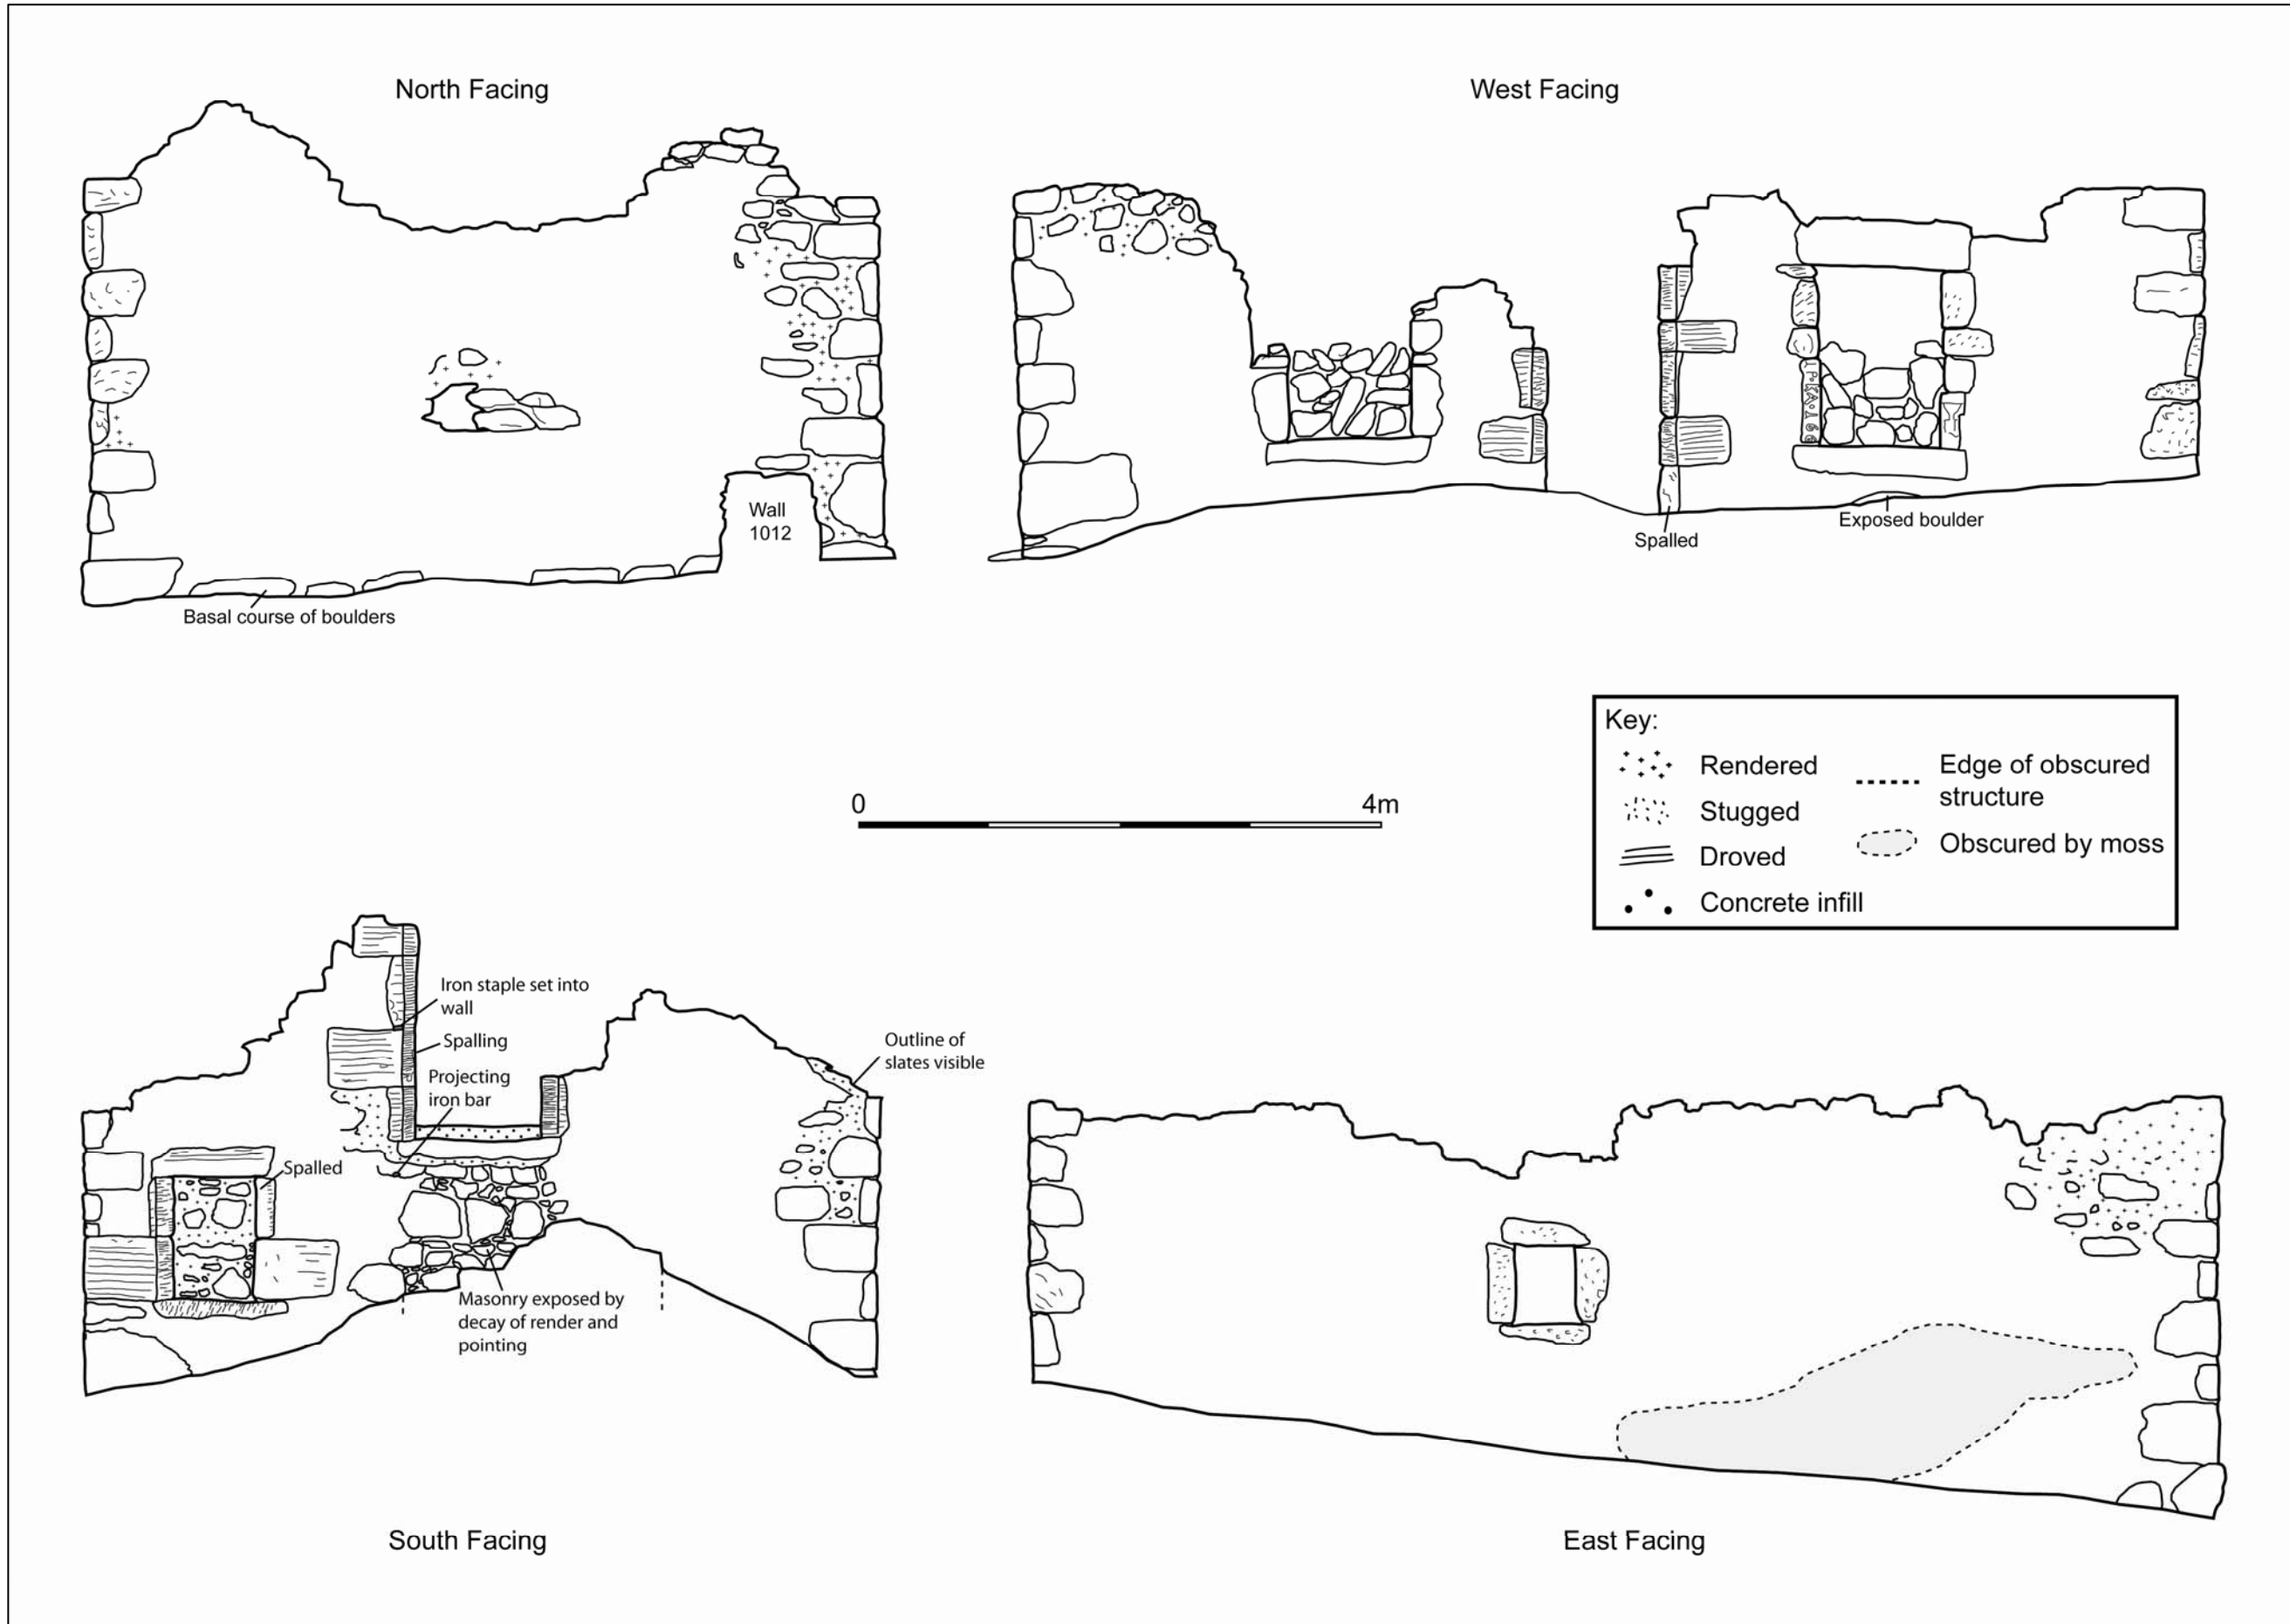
External Elevation Drawings. E Building (1001), Lategreen
